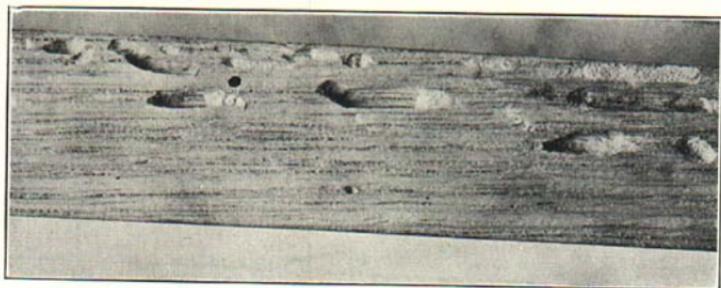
Work of powder-post beetles in flooring cut to show tunnels, enlarged about 2 x.
